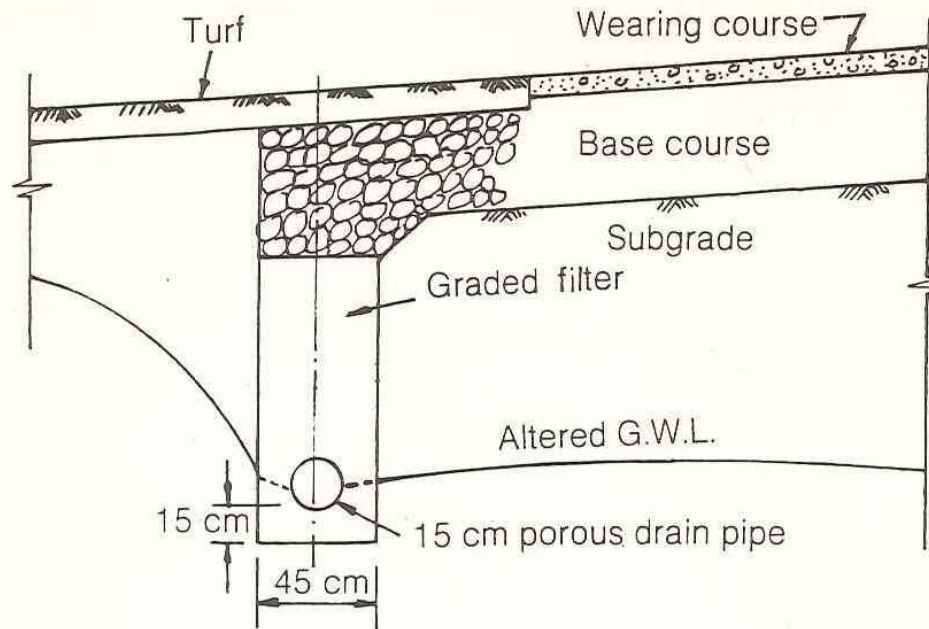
Typical runway drainage system—(c) Detailed cross-section of subgrade drain
